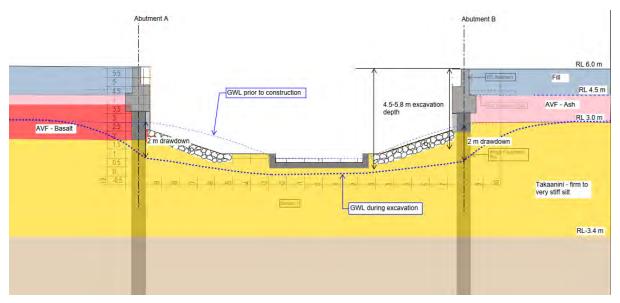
Figure Appendix C.7: Maximum 2 m drawdown condieration during construction in the winter.
